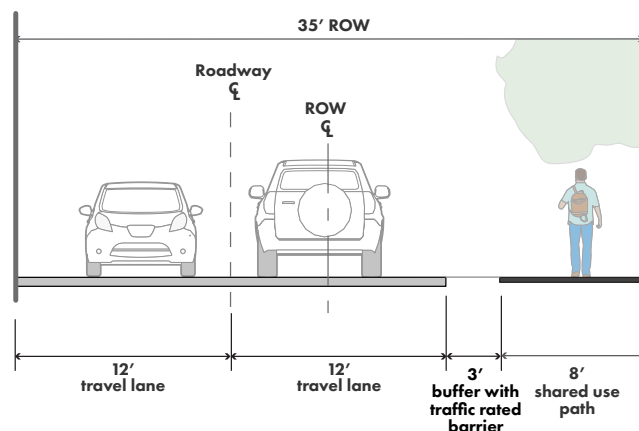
Illustration of a possible buffered sidewalk along Roaring Springs Road, connecting to Botetourt Elementary School and the Courthouse
